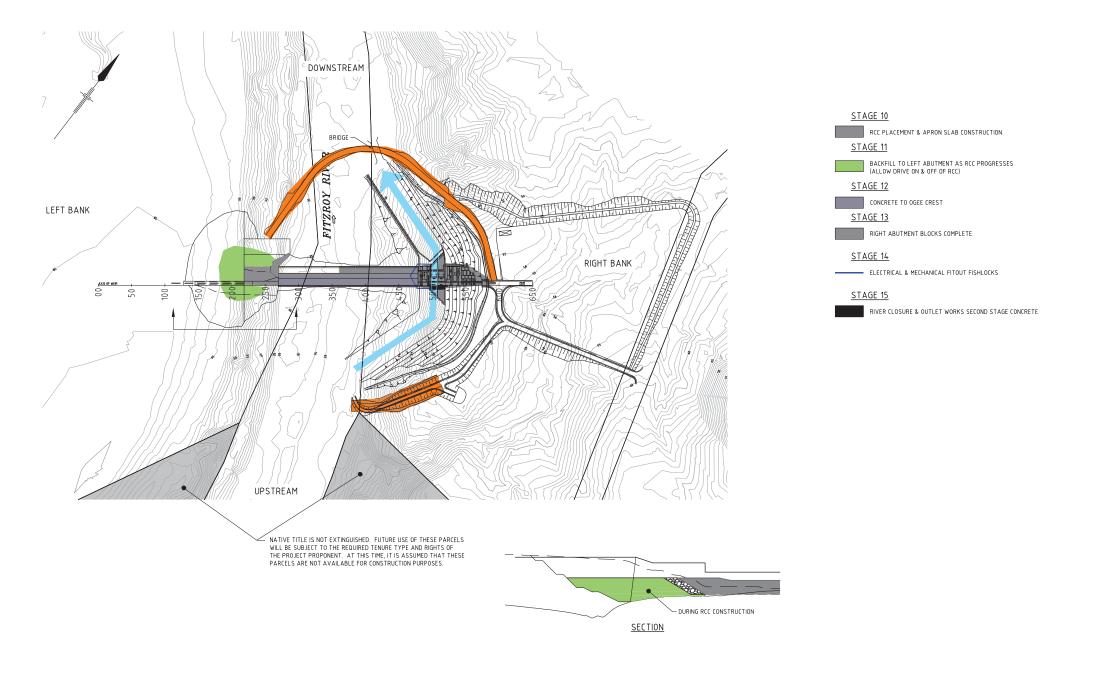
Rookwood Weir construction sequencing (Sheet 4 of 4)
